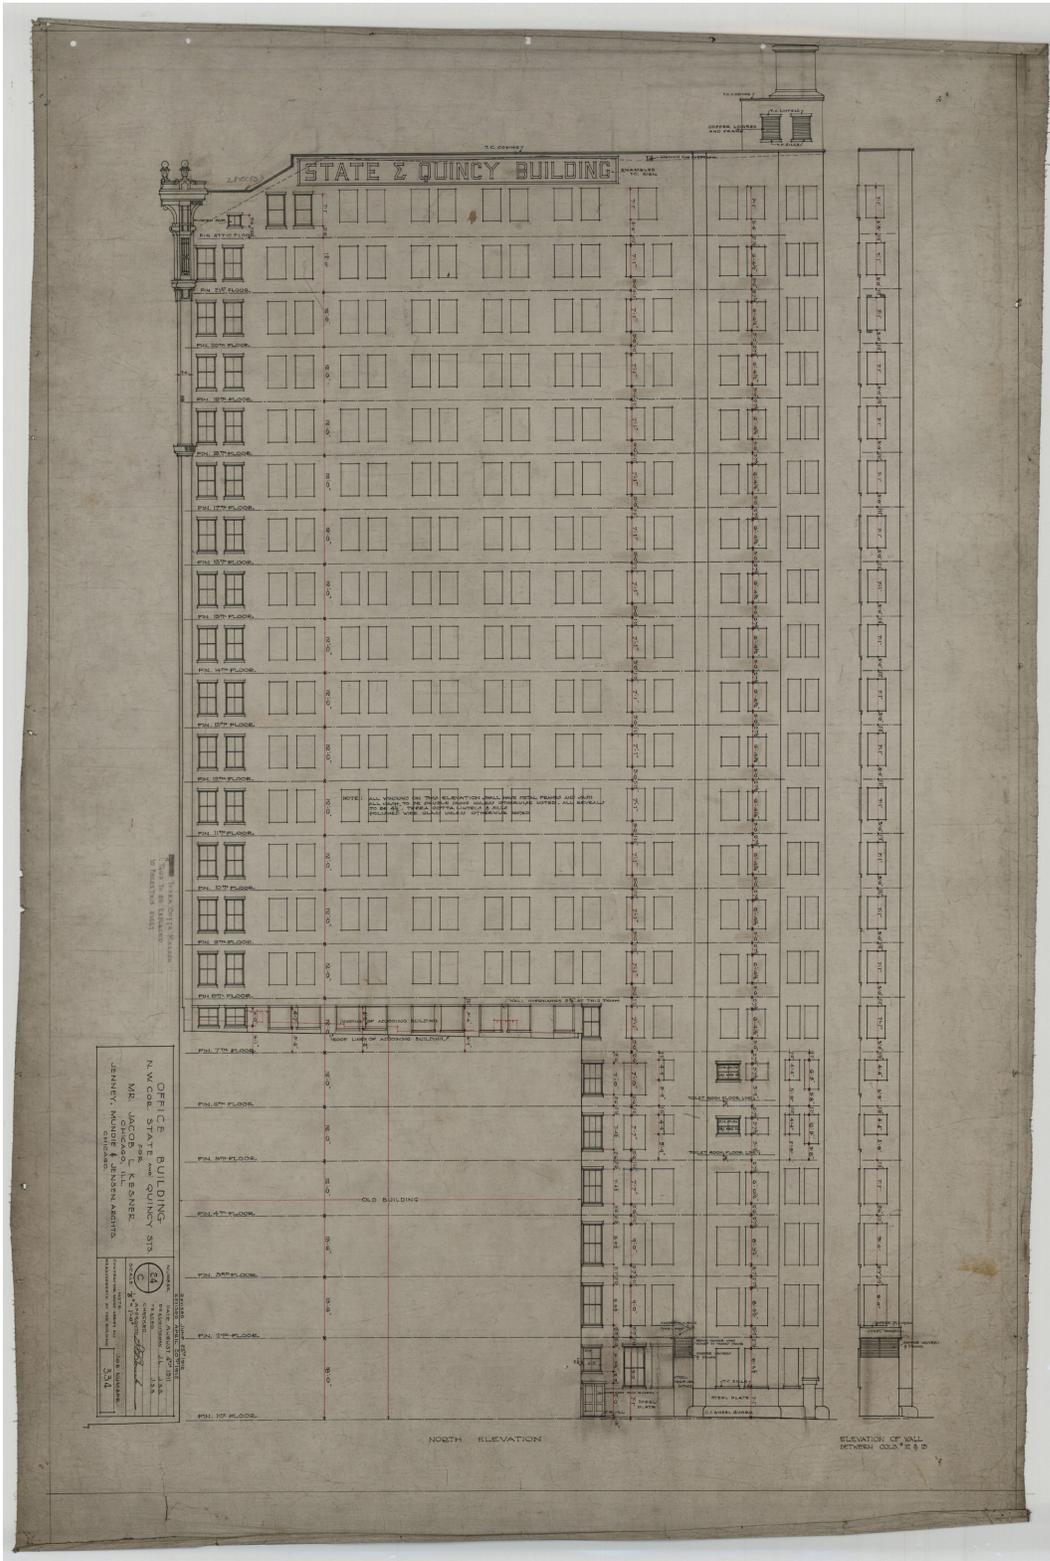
Original drawing of north façade, Jenney, Mundie & Jensen, 1911.
